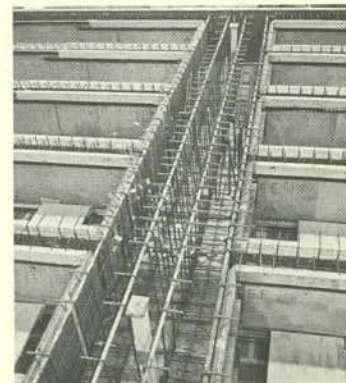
Bent Cap Reinforcement and Formwork for Specimen SF-5
